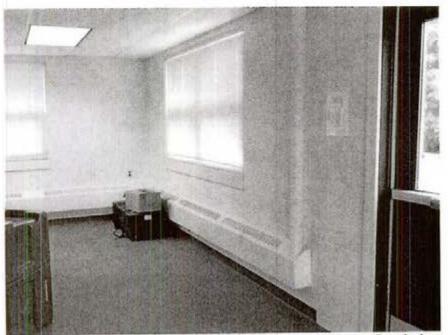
Wall heat registers, fiberglass Thermal System Insulation; carpet floor.
